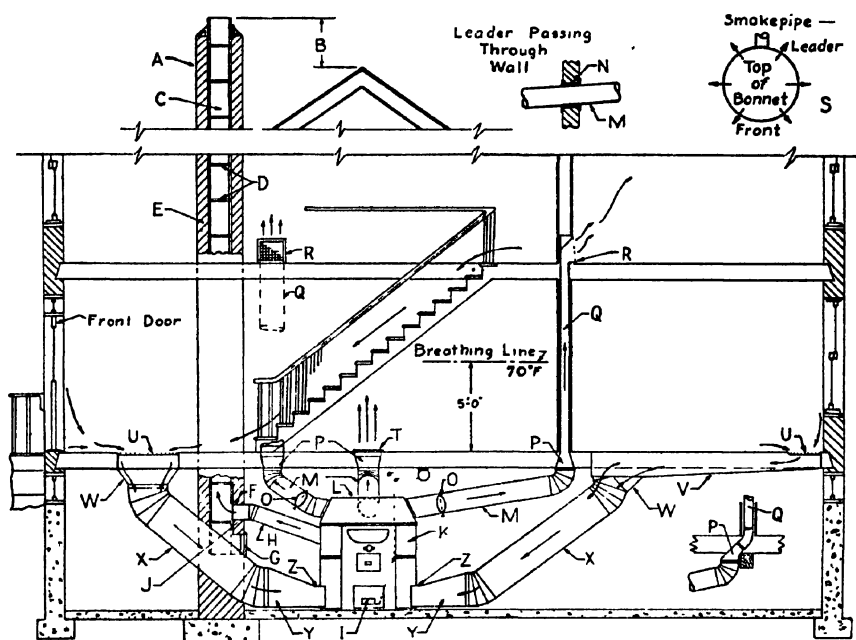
A SECTIONAL VIEW OF A TYPICAL PLANT SHOWING GOOD INSTALLATION PRACTICES^a
